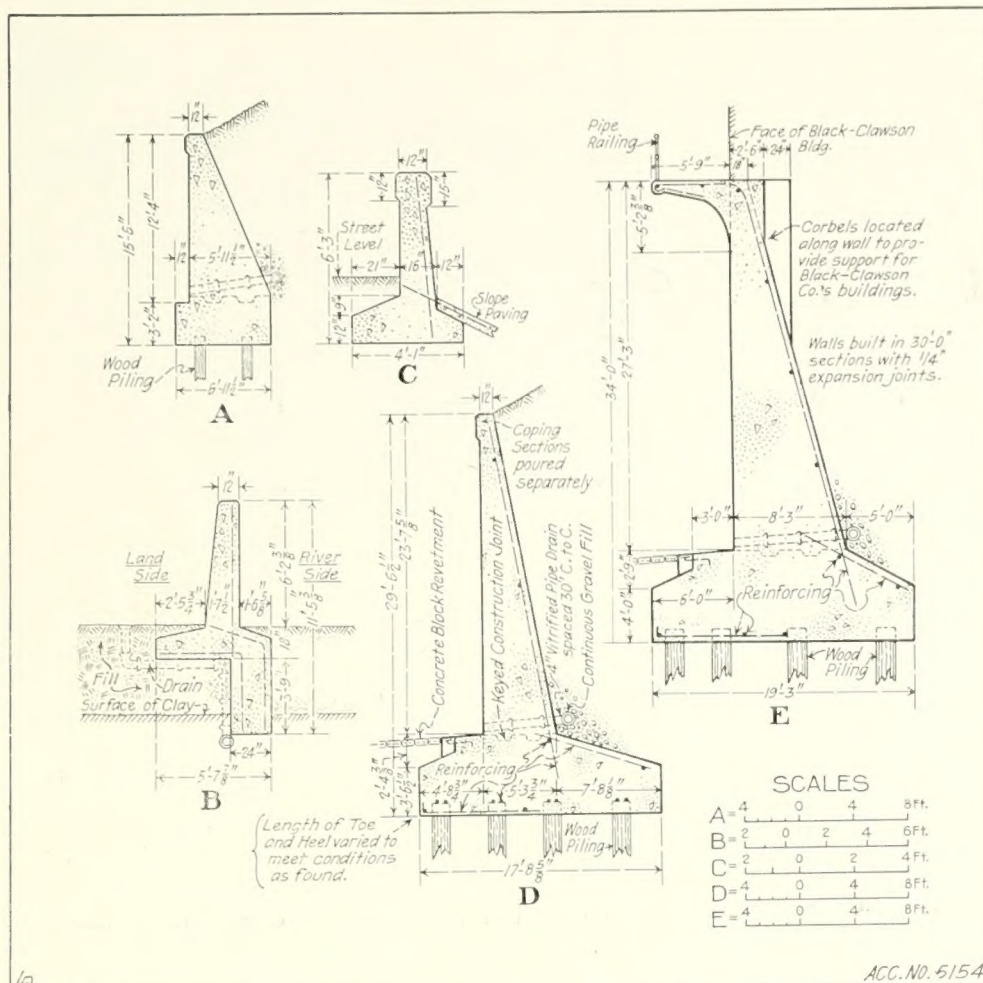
TYPICAL SECTIONS OF WALLS CONSTRUCTED AT HAMILTON.
